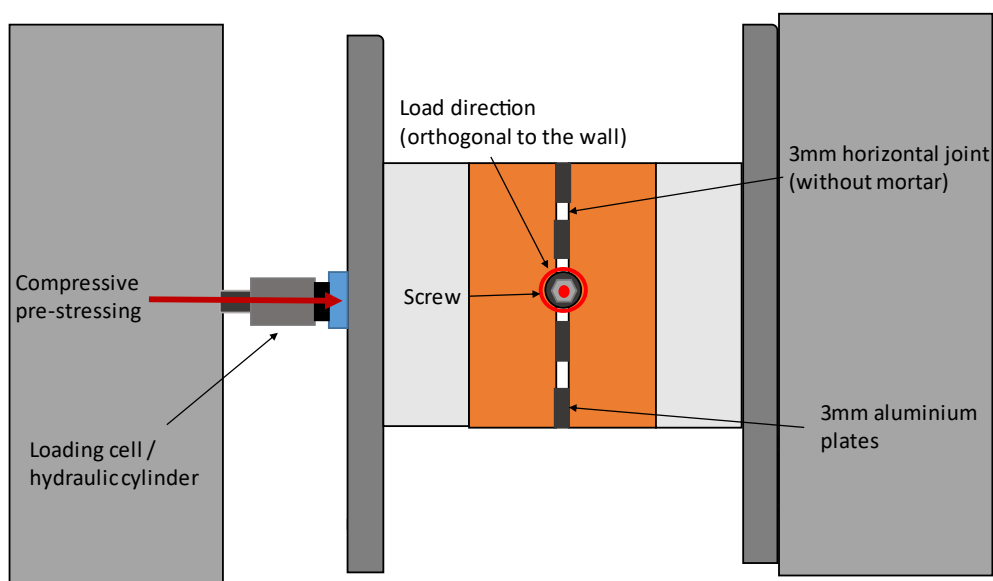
Schematic drawing of test setup for tension tests in horizontal joints (test series A1j)
